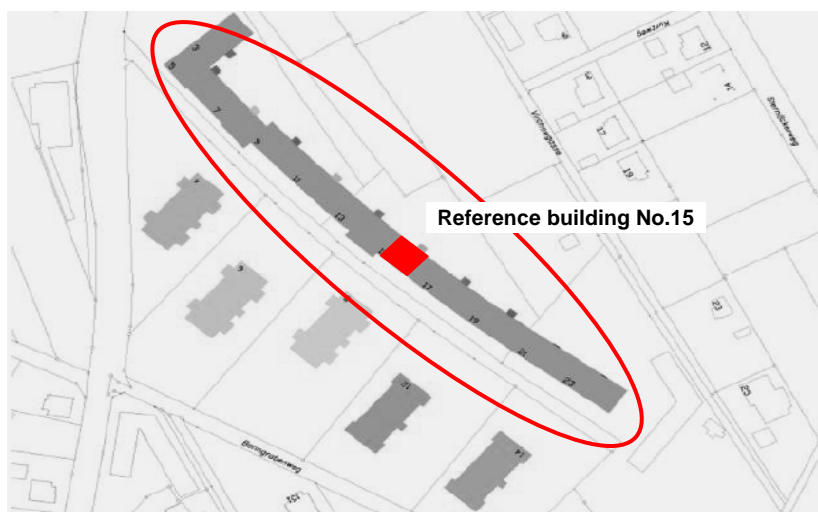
Site plan showing the entire area and location of building "Dieselweg 3-19" (source: Hohensinn ZT GmbH)
